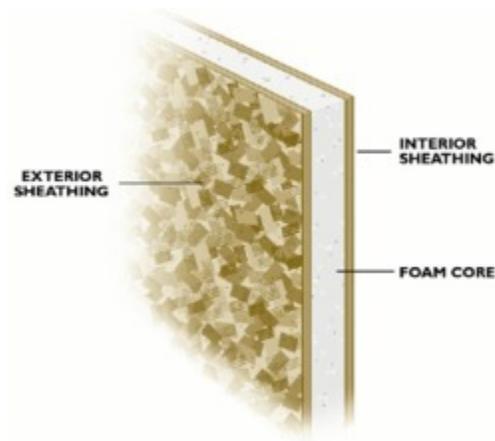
Cross section of a typical structural insulated panel wall (SIP Association, 2005). A foam core is sandwiched between two pieces of sheathing, giving a more uniform R-value across the wall.
